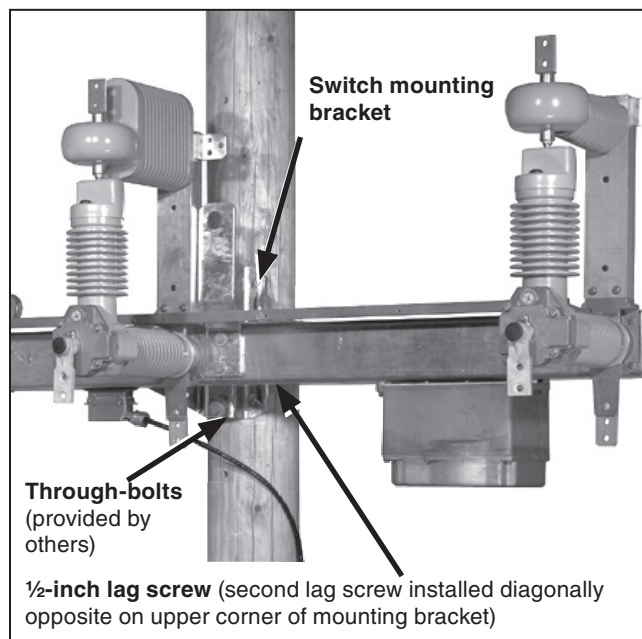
Guiding switch into through-bolts (vertical mounting configuration shown).
